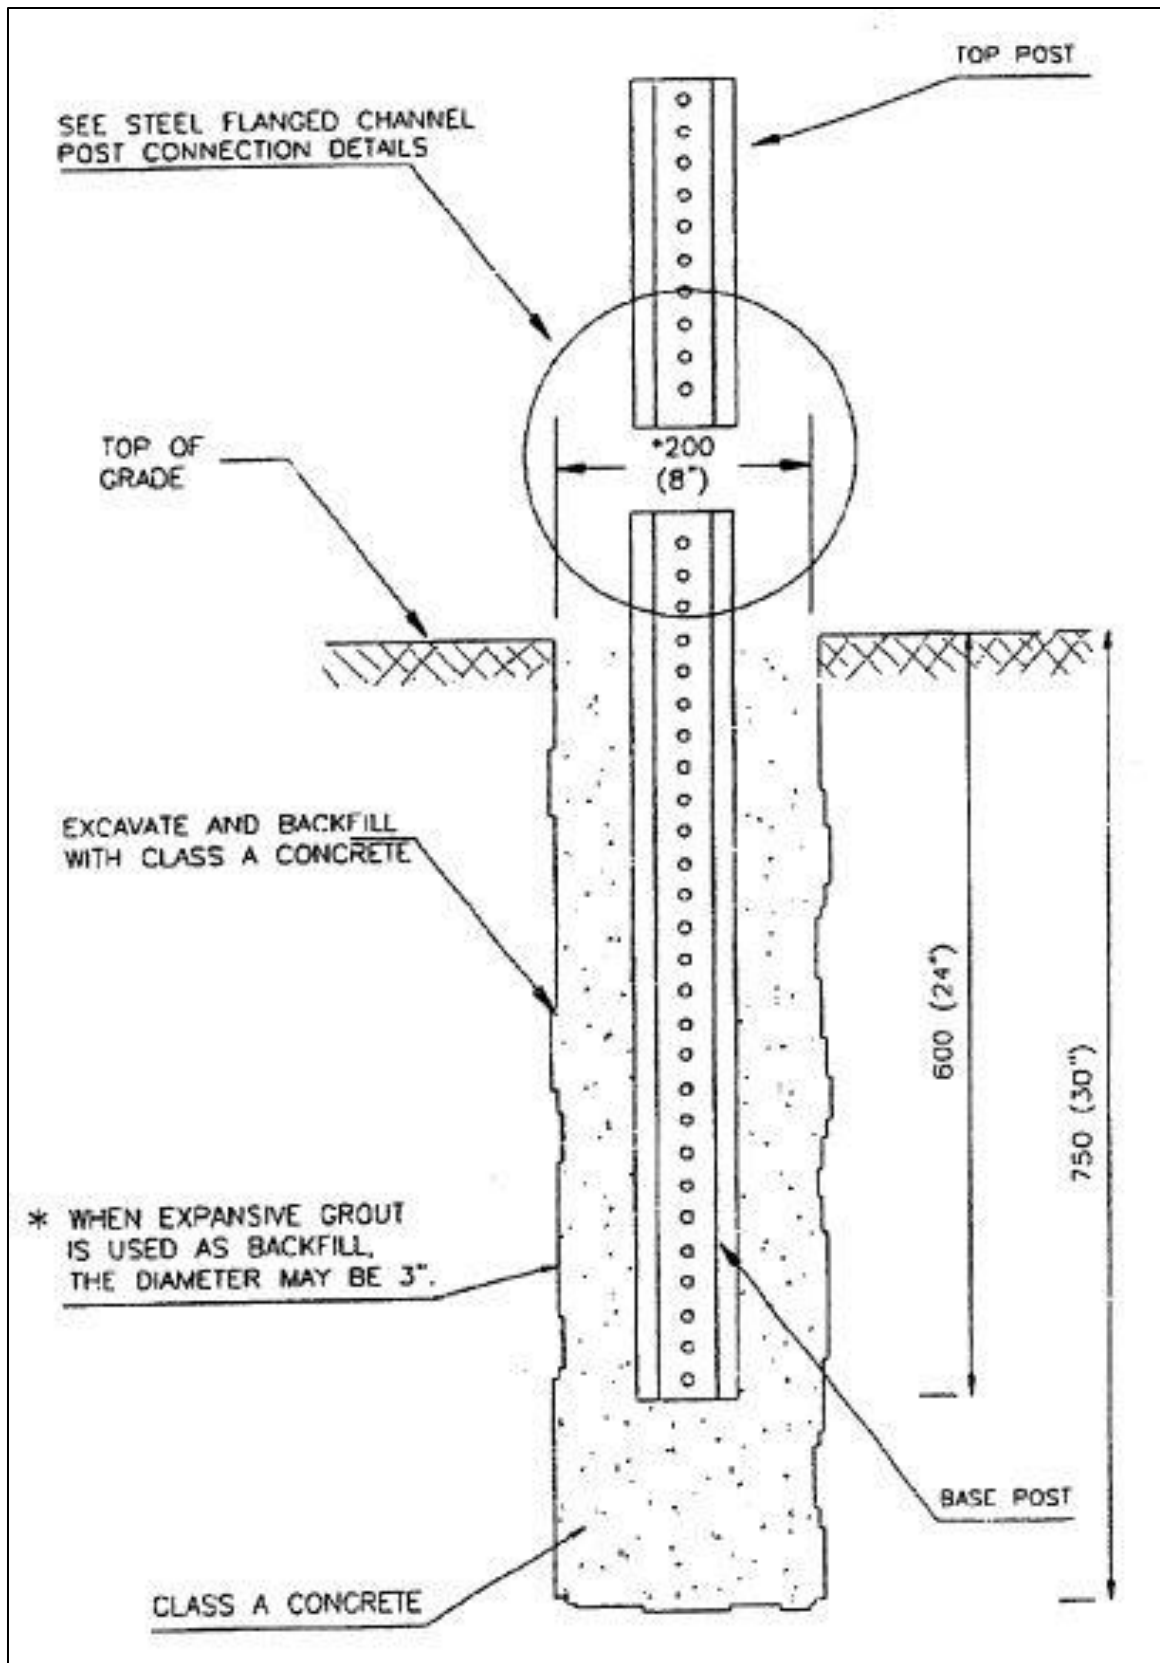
U-channel foundation detail for rock condition (PRHTA, 2010)
